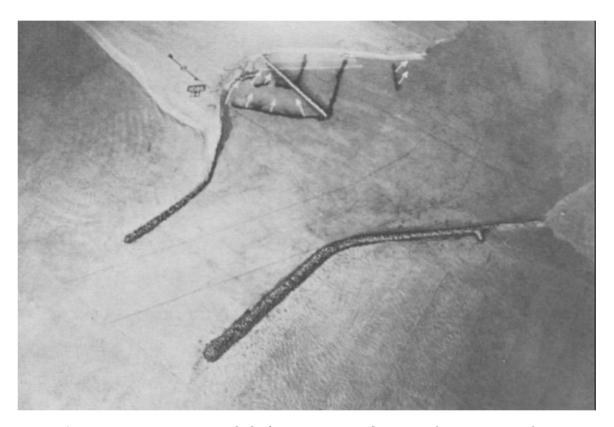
Recommended improvement plan, Newburyport Harbor, Massachusetts.
